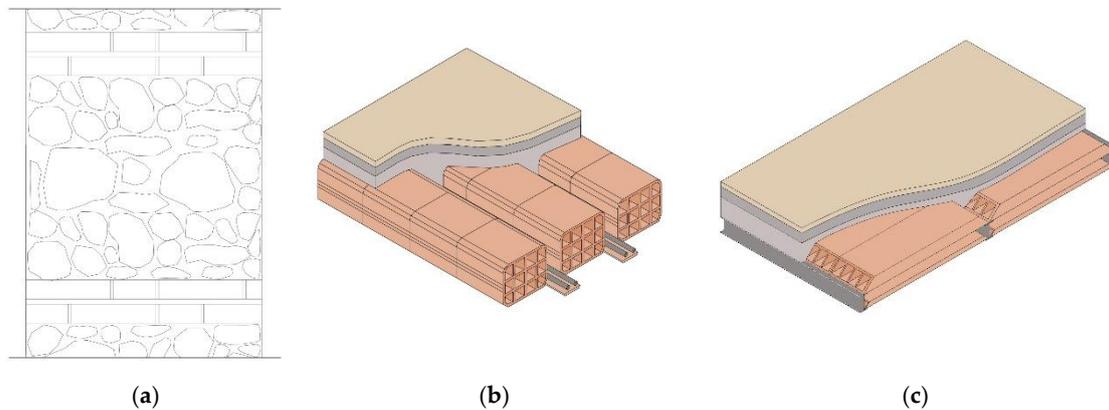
Construction technology: (a) stone masonry, (b) reinforced concrete slab and hollow block cast in place, (c) slab made of double T beams and brick hollow flat blocks.
